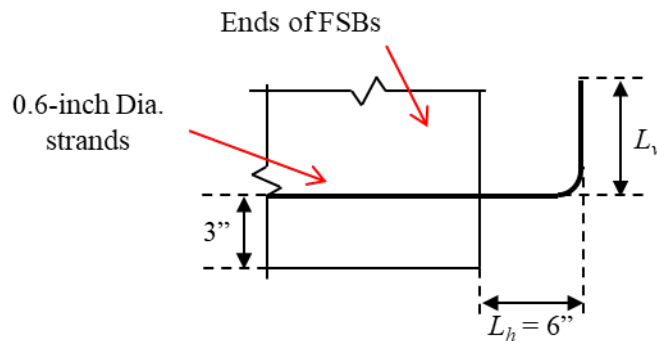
Non-prestressed strand hook details at ends of FSB
